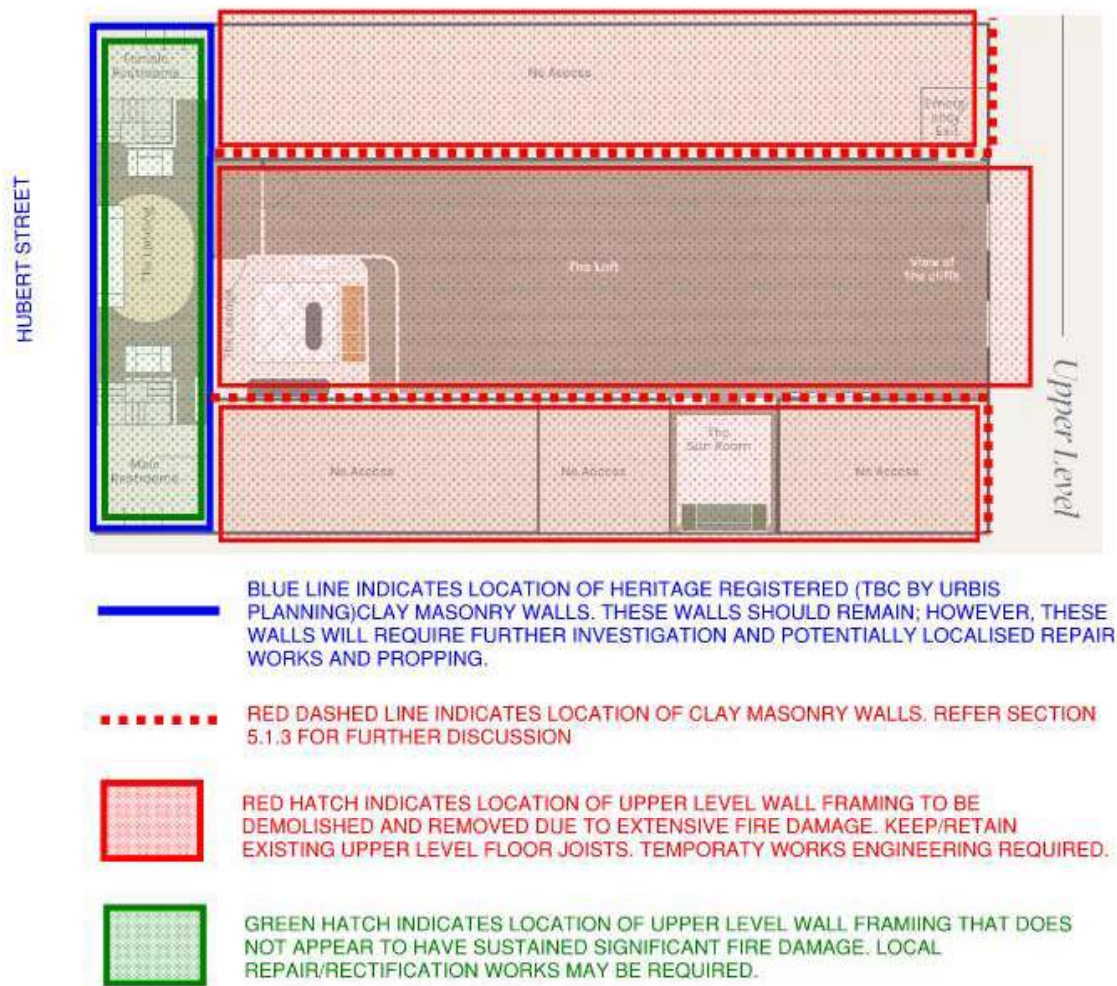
Upper -Level Floor Plan, Identifying Locations of Timber Wall Framing to be Demolished/Removed.
